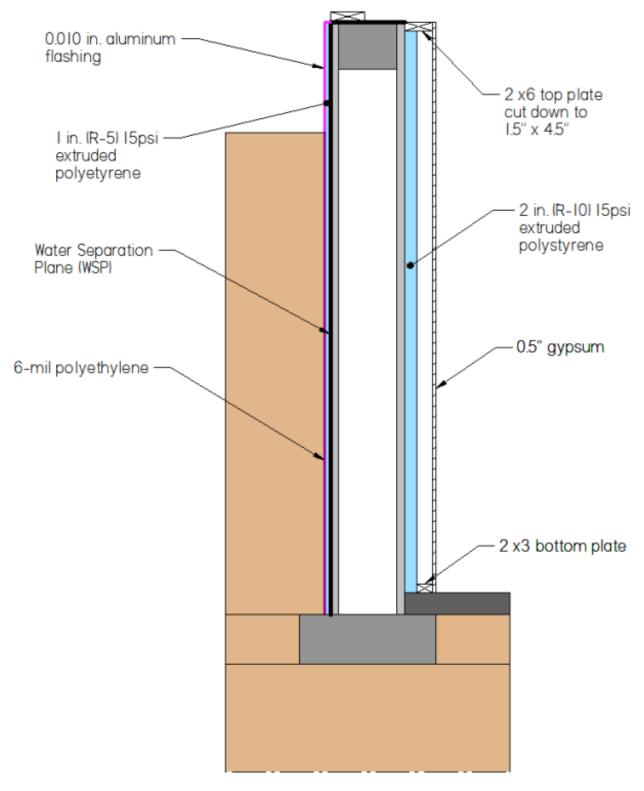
Base + wall top and exterior full height wall adhered WSP + exterior R-5 and interior R-10 extruded polystyrene insulation
